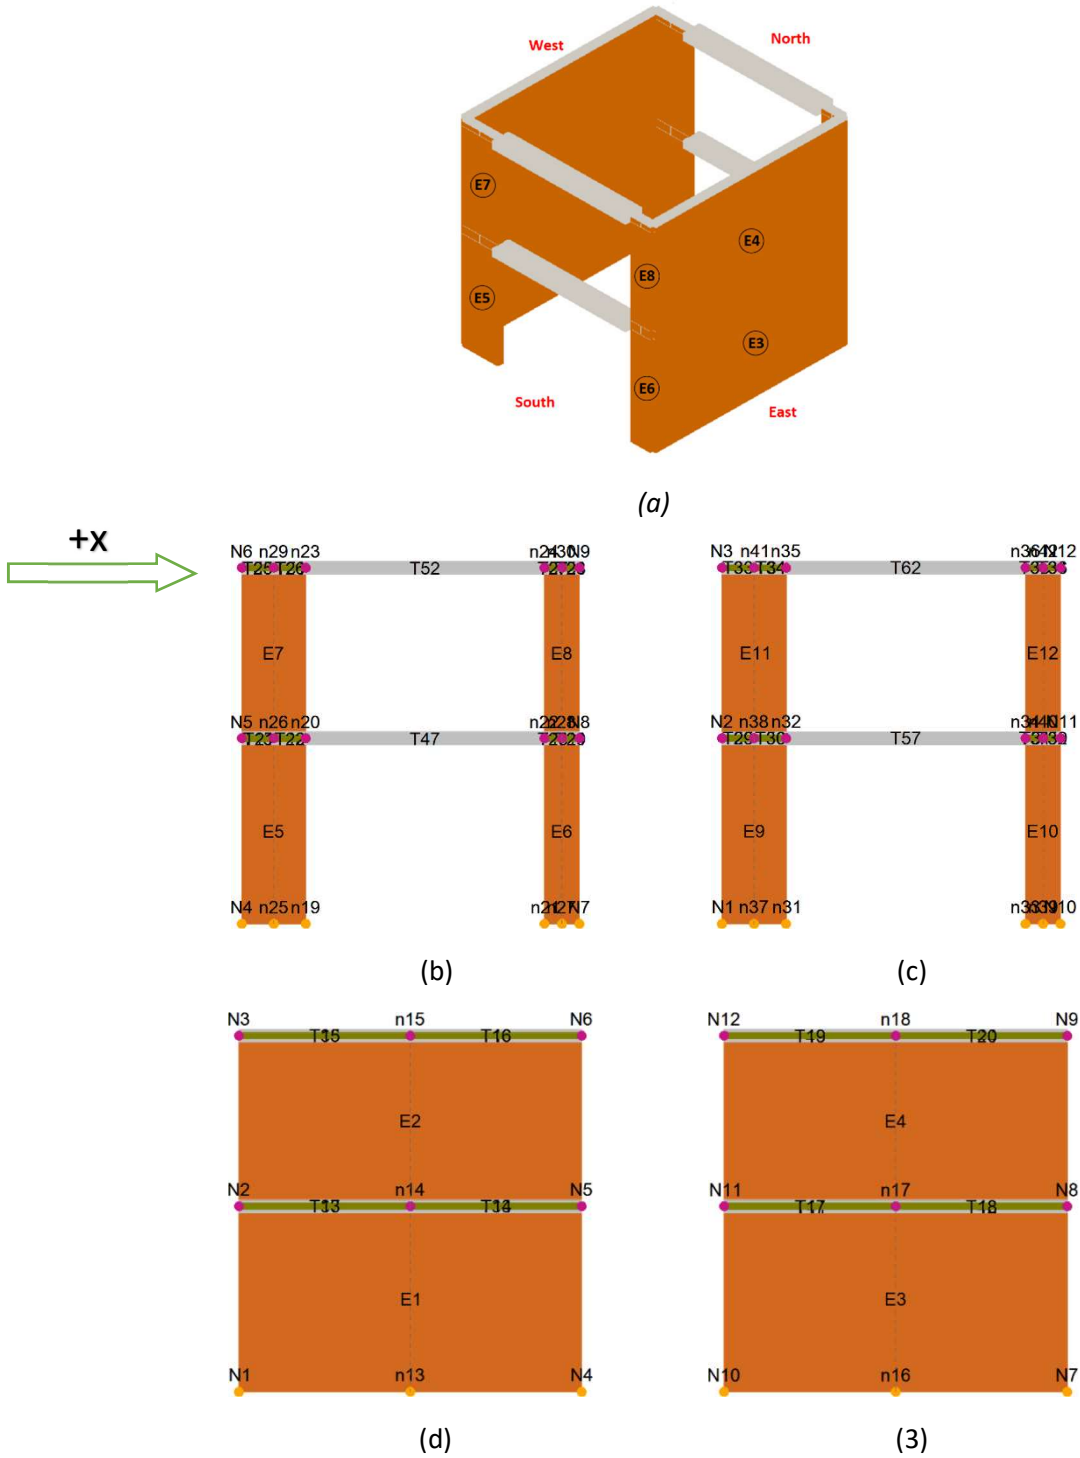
Model discretization: (a) 3D model, (b) south façade, (c) north façade, (d) west façade and (e) east façade
